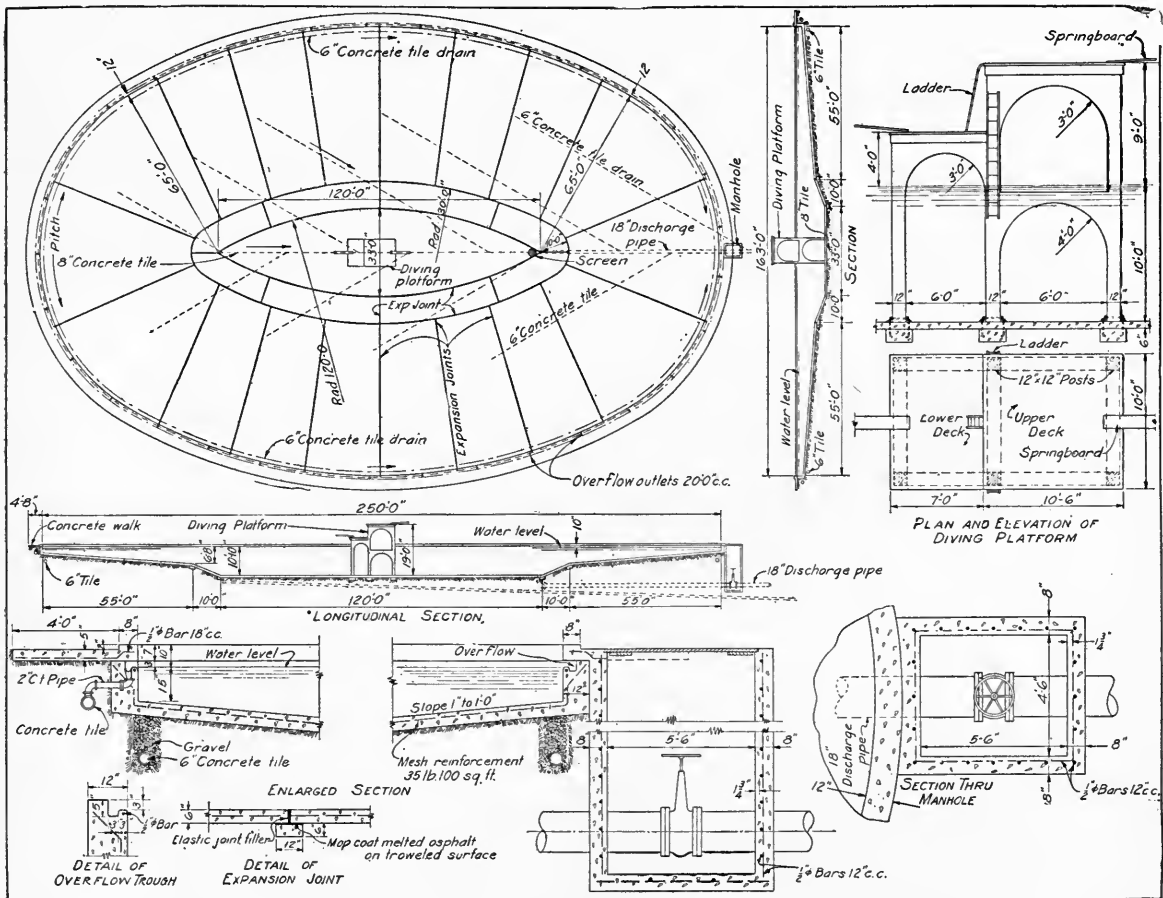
PLAN FOR LARGE OVAL POOL¹
